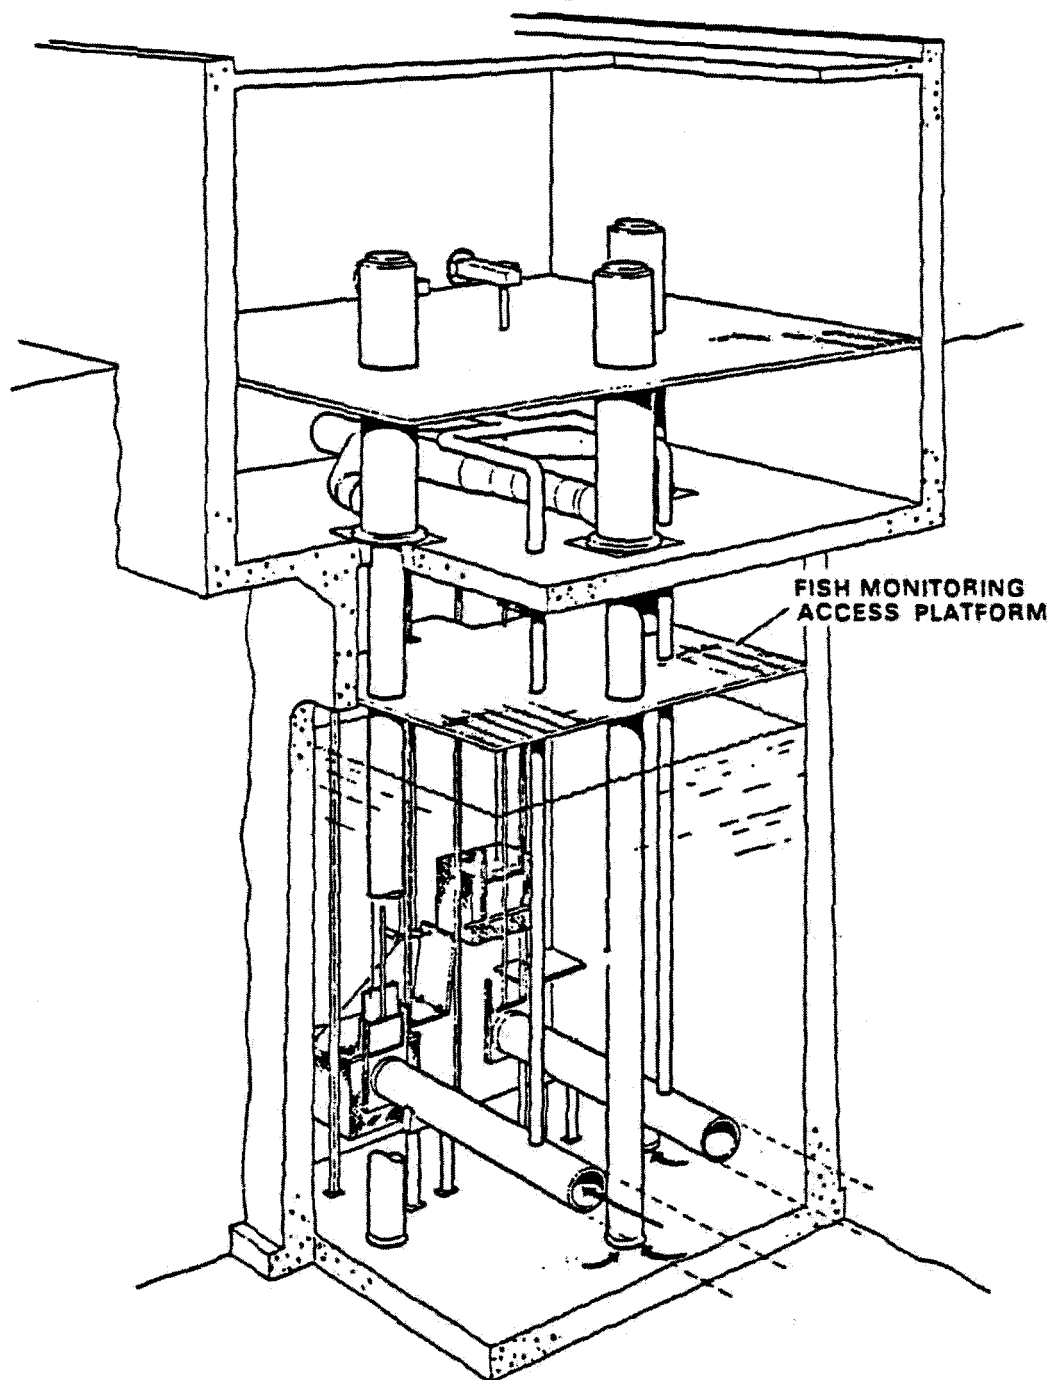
WNP-2 make-up water pumphouse fish monitoring facilities (from WPPSS 1978).
